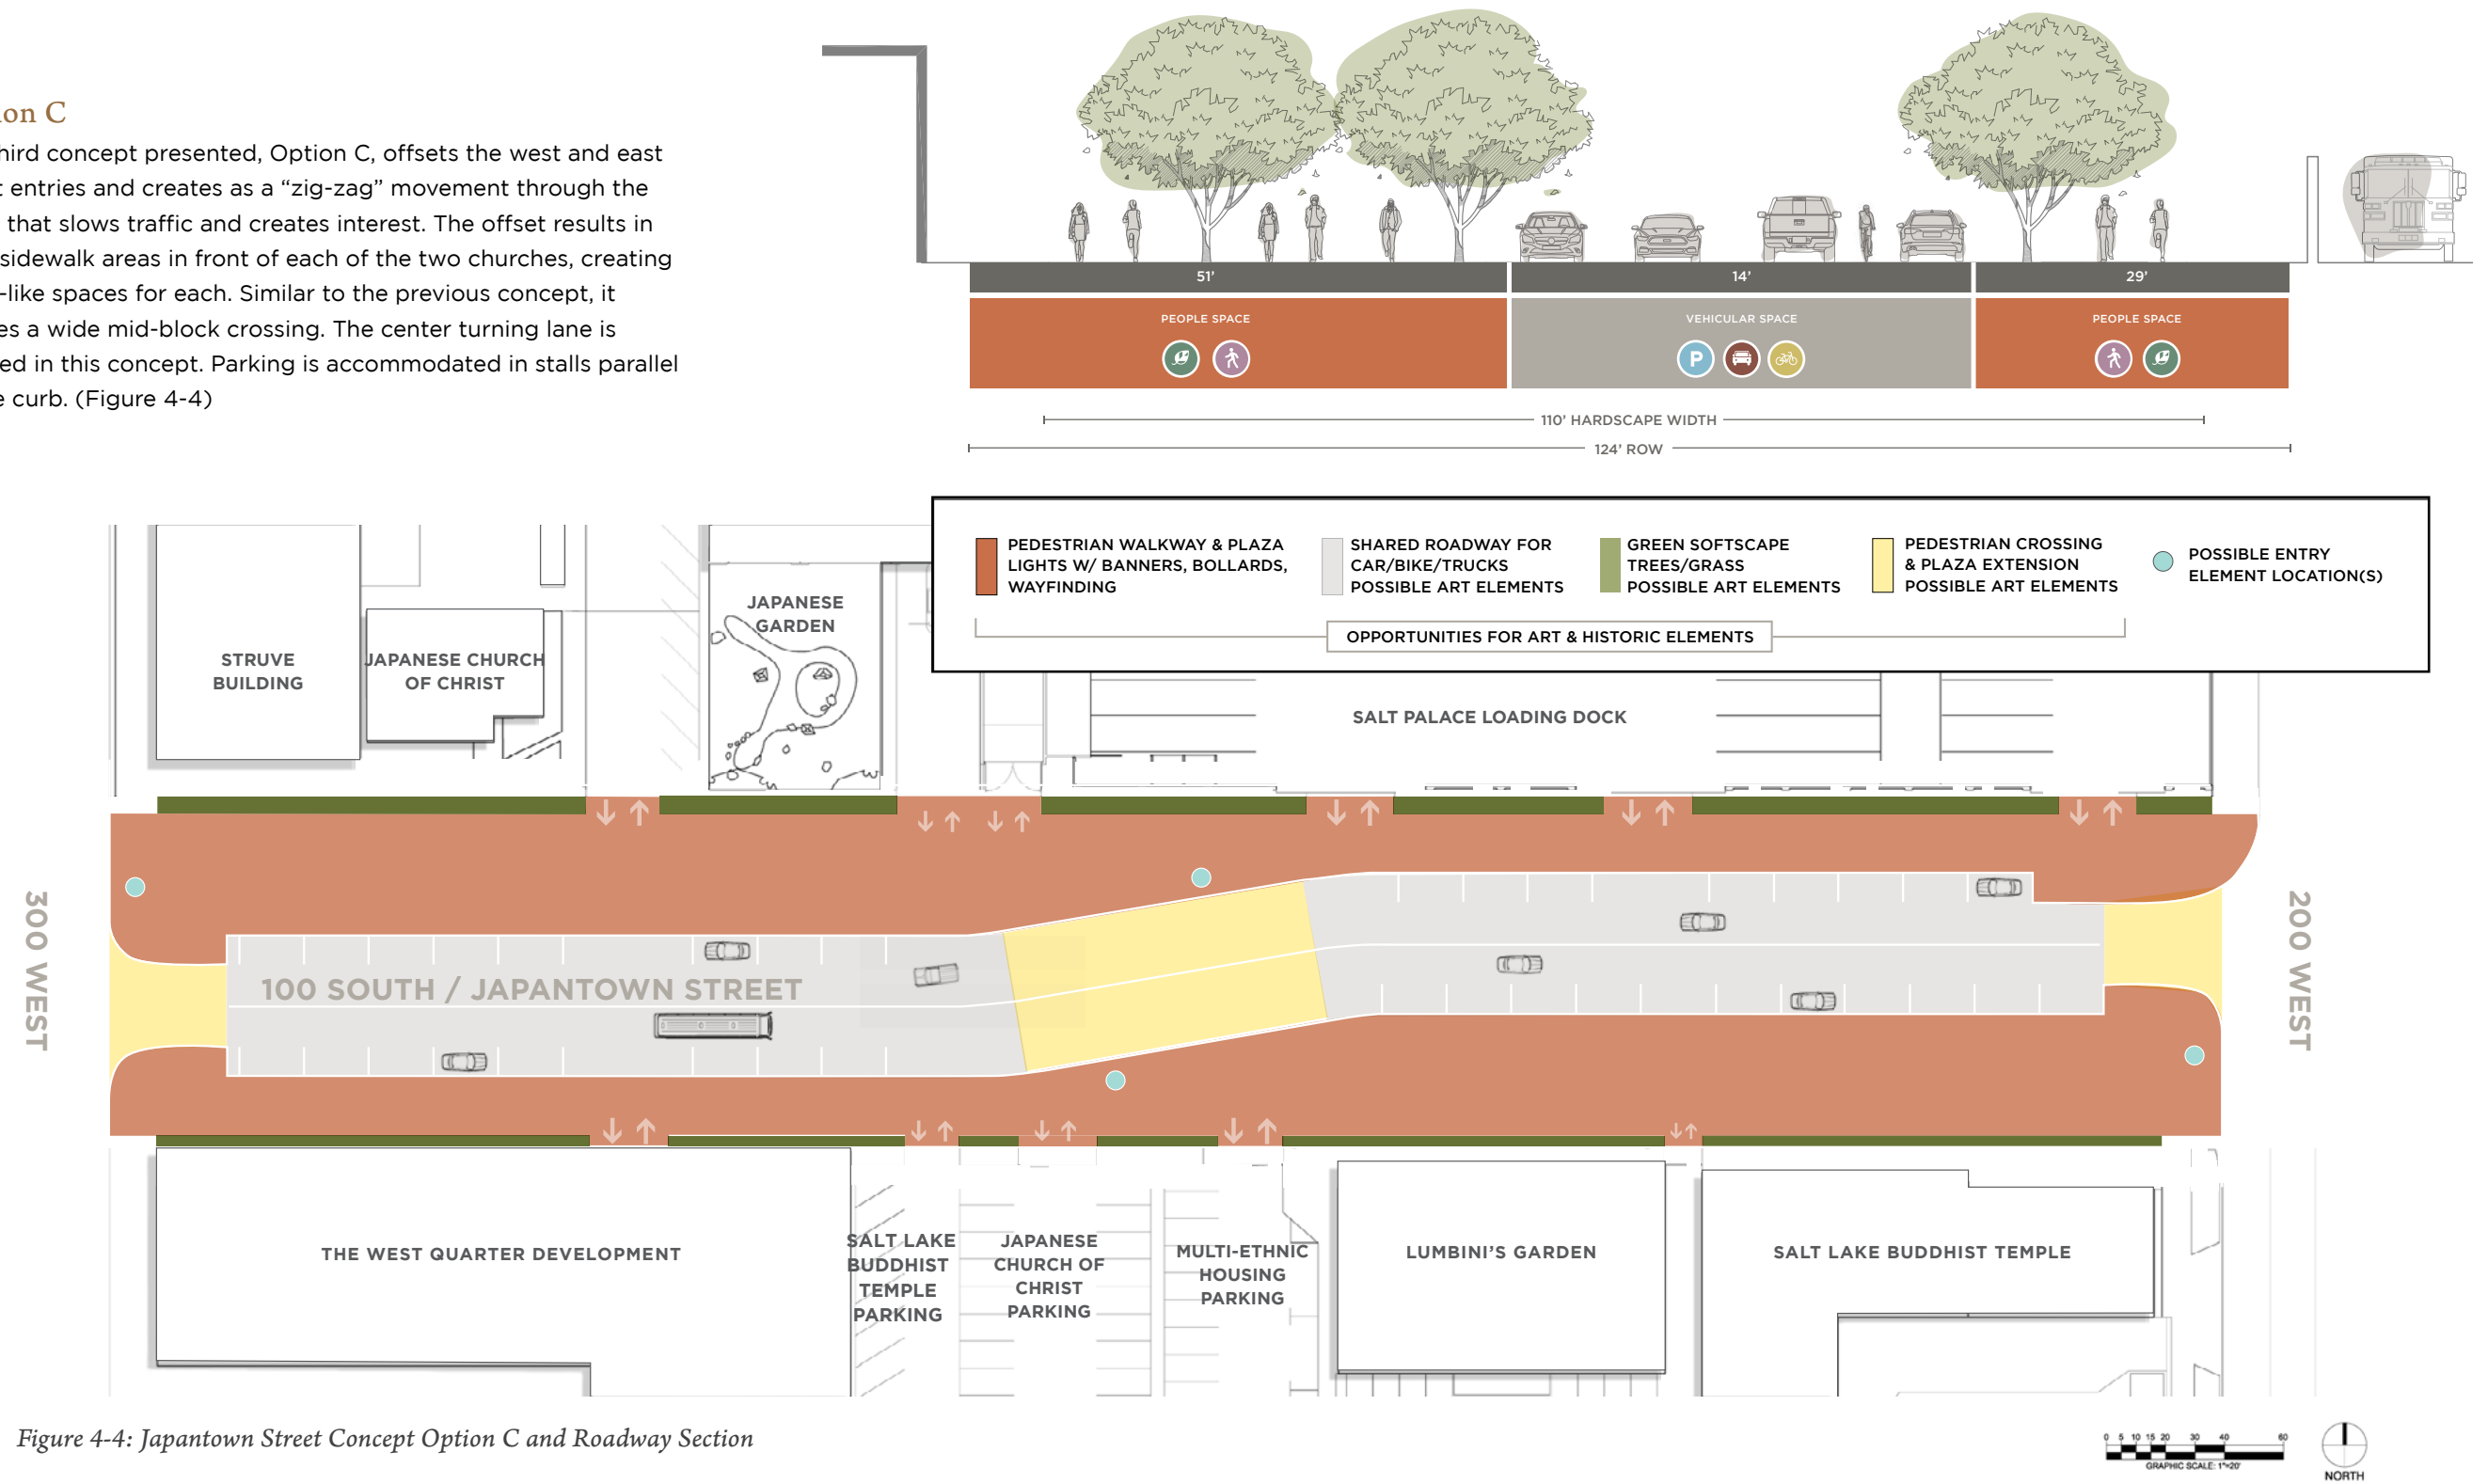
Japantown Street Concept Option C and Roadway Section
